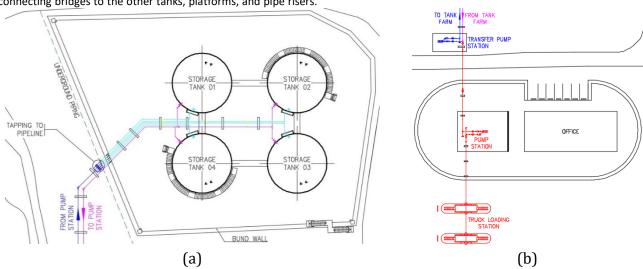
Plant layout used in this study: a.) Tanks and b.) Truck Loading Station
